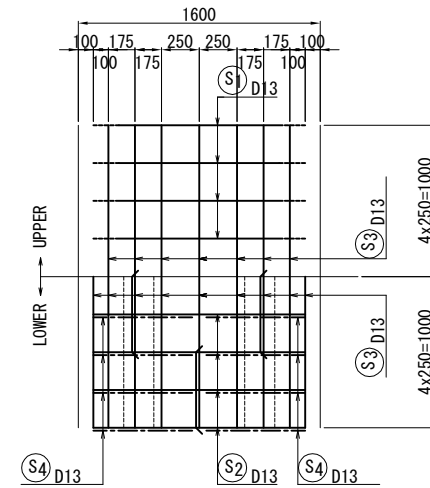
DETAIL OF BOX CULVERT TYPE 1000 x 1000
